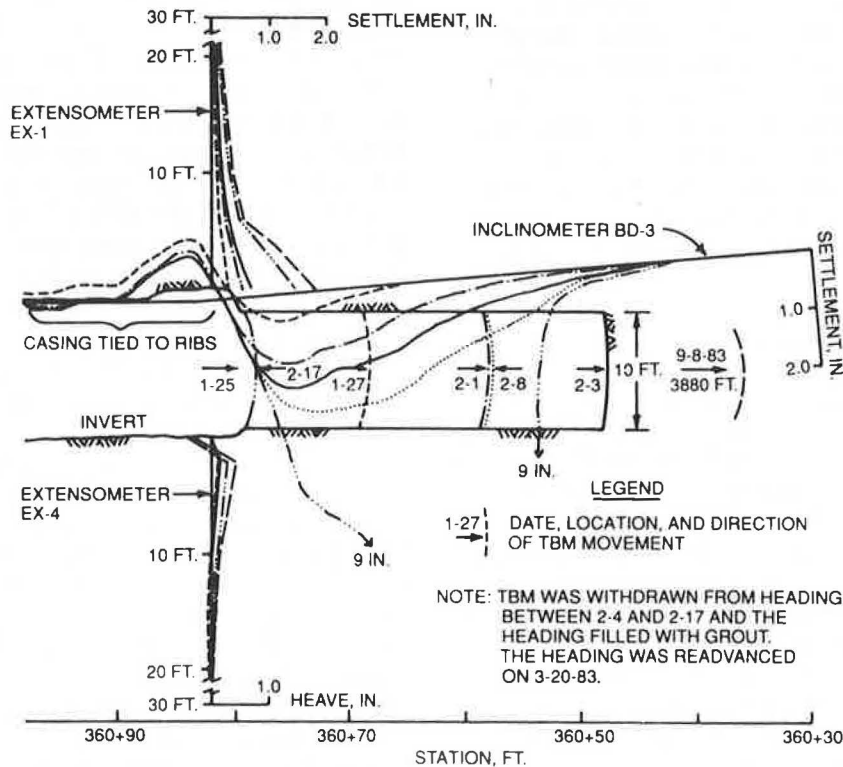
Vertical rock deformations in a tunnel in response to tunnel boring machine advance (6).
